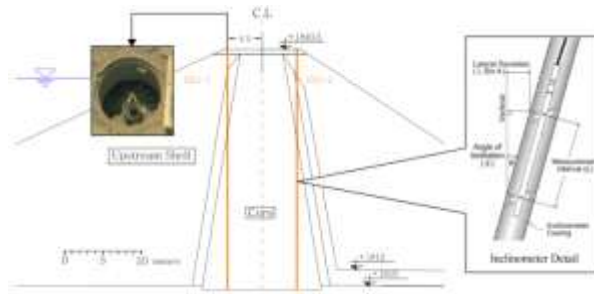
The arrangement of Inclinometers and their details in Siah Sang dam [9]
